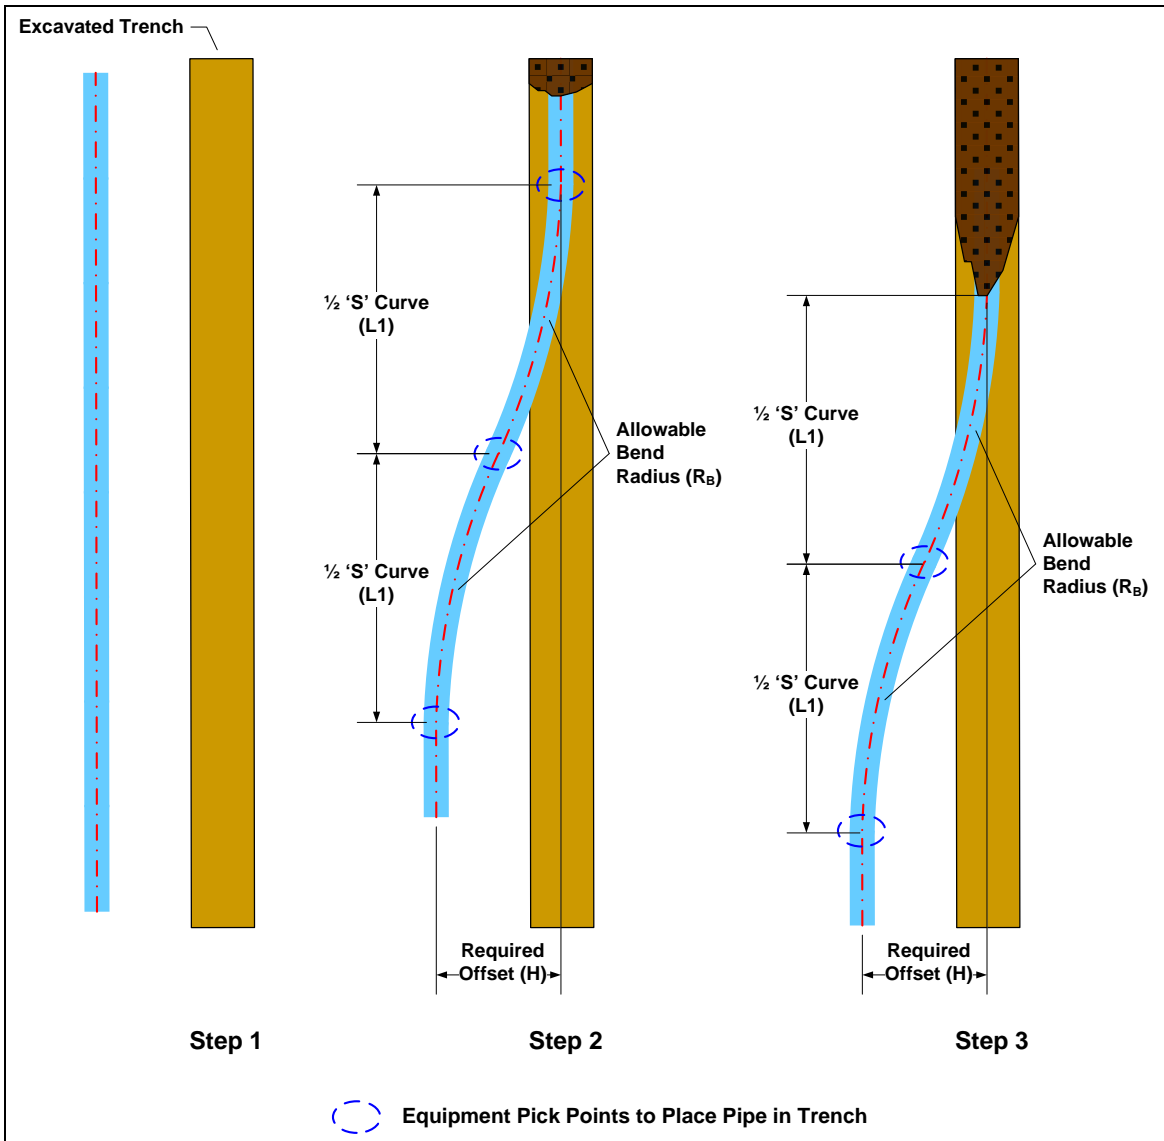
Direct Bury Pipe Placement Installation Steps
